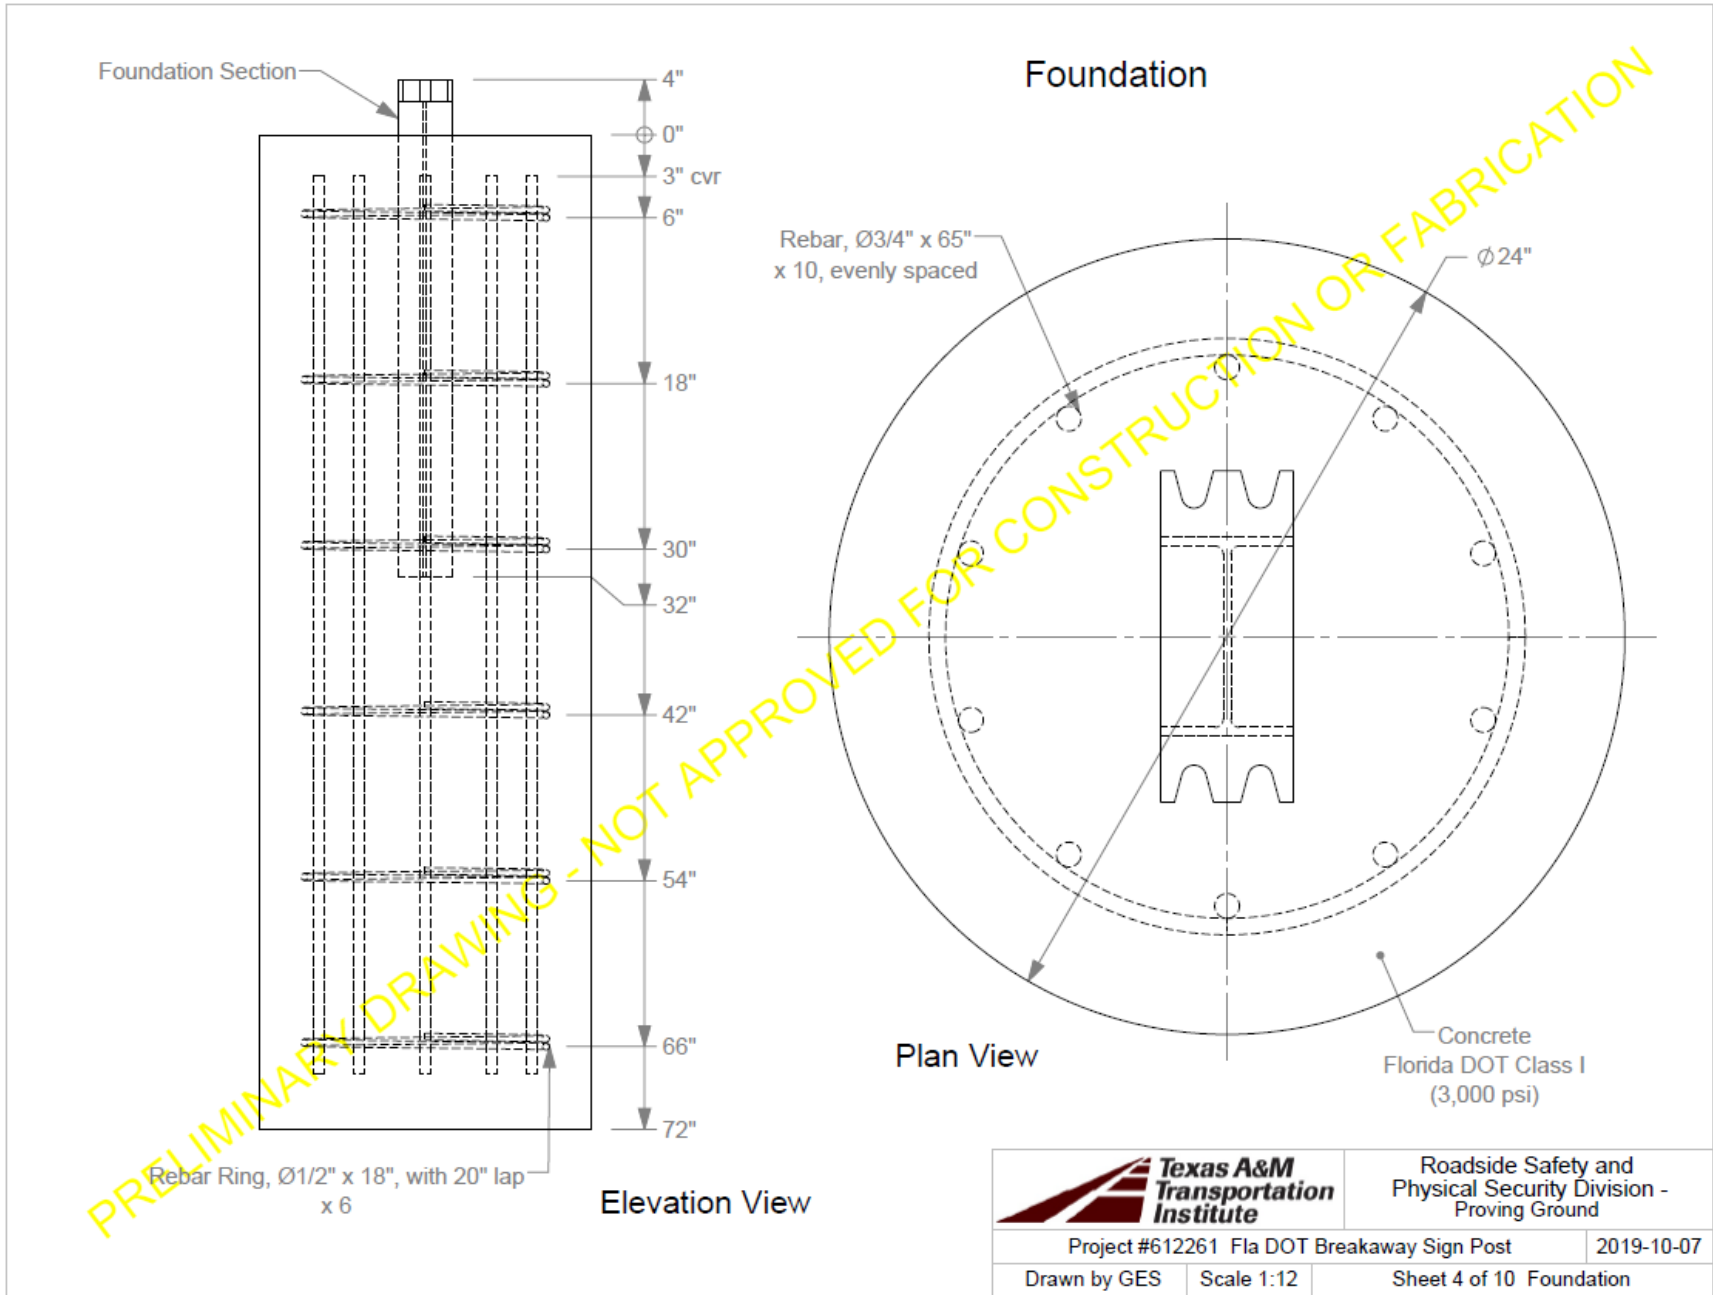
Preliminary Drawing (Sheet 4 of 10).
